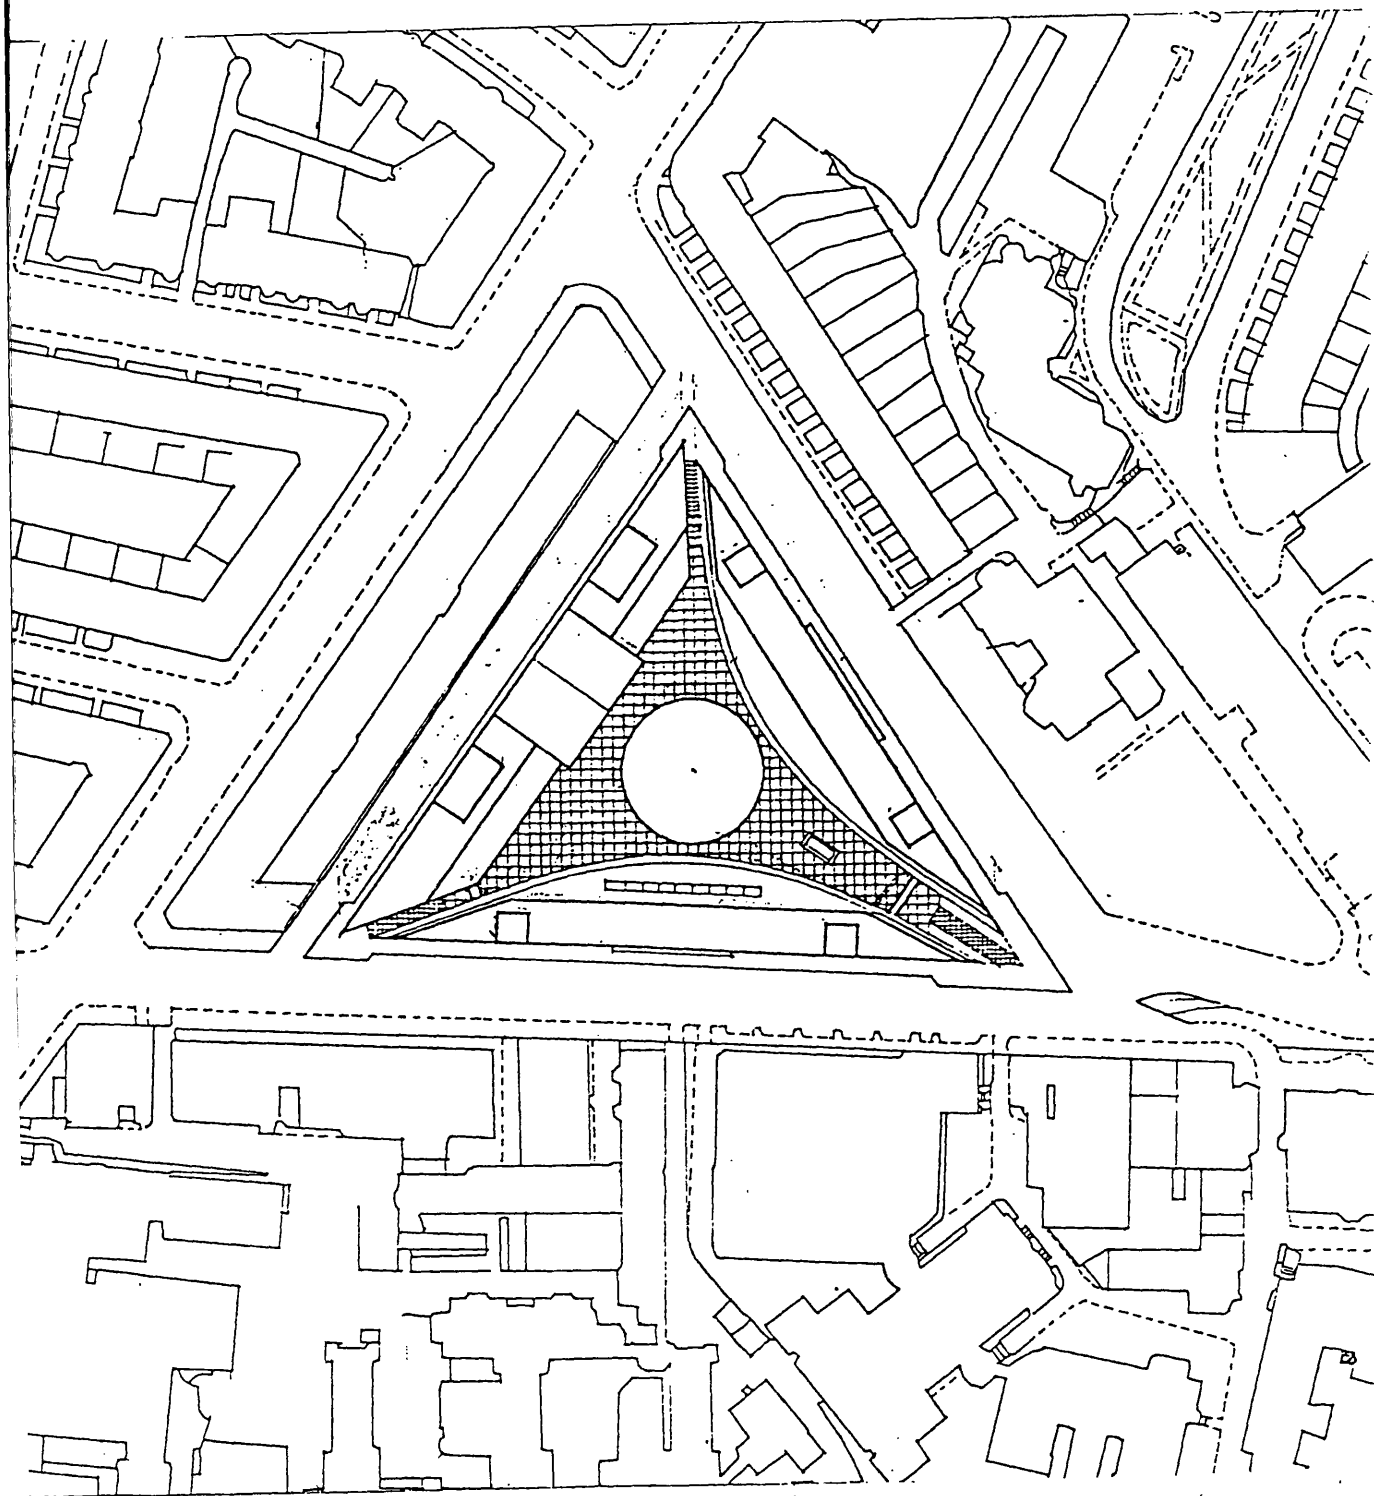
(b): PROPOSAL FOR TRIANGULAR SITE-ROOF PLAN....(139)
